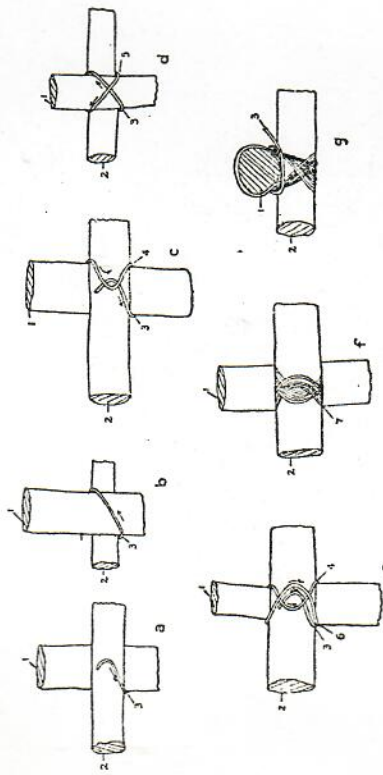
Alternating curves lashing, used for principal parts of house framework; lashing shown for fastening together tiebeam (1) and wall plate (2). *a*, view from above: sennit braid laid on wall plate and held with thumb; free end makes reverse turn on under side of wall plate (3). *b*, view from below: free end makes transverse turn across tiebeam. *c*, view from above: sennit braid (4) brought across commencement end, thumb holds crossing cords in place while braid makes curved turn across and down at wall plate (4). *d*, view from below: braid (5) makes transverse turn across and up tiebeam to curve around wall plate. *e*, view from above: braid (6) curves to right across second curve (4) and locks preceding two curves in place; thumb then removed and rough sennit does not slip. *f*, view from above: repetition of two curved turns successively applied on outer side of previous turns produces pattern (7); number of lashings varies according to elements, average number being 5 curves on either side, 10 in all. *g*, side view: crossings of turns and half of one design; braid (3) makes number of horizontal circumferential turns around lashing turns between two wooden elements; end of braid fixed by half hitches around last loops. (Diagram adapted from Buck, 29, fig. 5, p. 72.)
